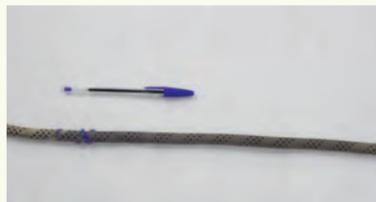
HAUL ROPE WITH DAMAGED SECTION
